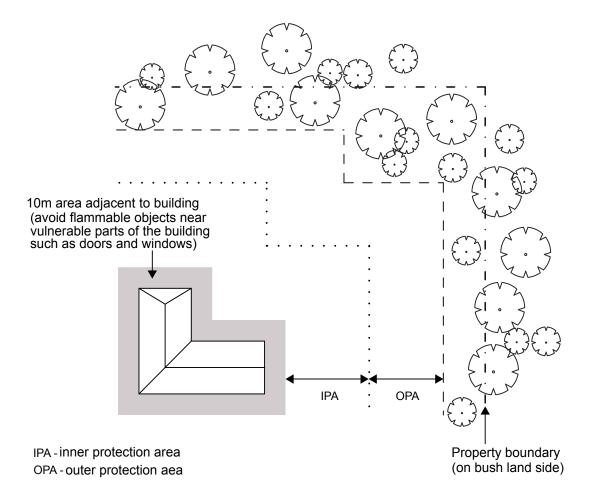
Asset Protection Zones should incorporate an Inner Protection Area (defendable space closest to the building) and an Outer Protection Area (reduced fuel to slow rate of spread and filter embers). The actual APZ width is to be determined through a bushfire risk assessment prior to lodging a DA.
